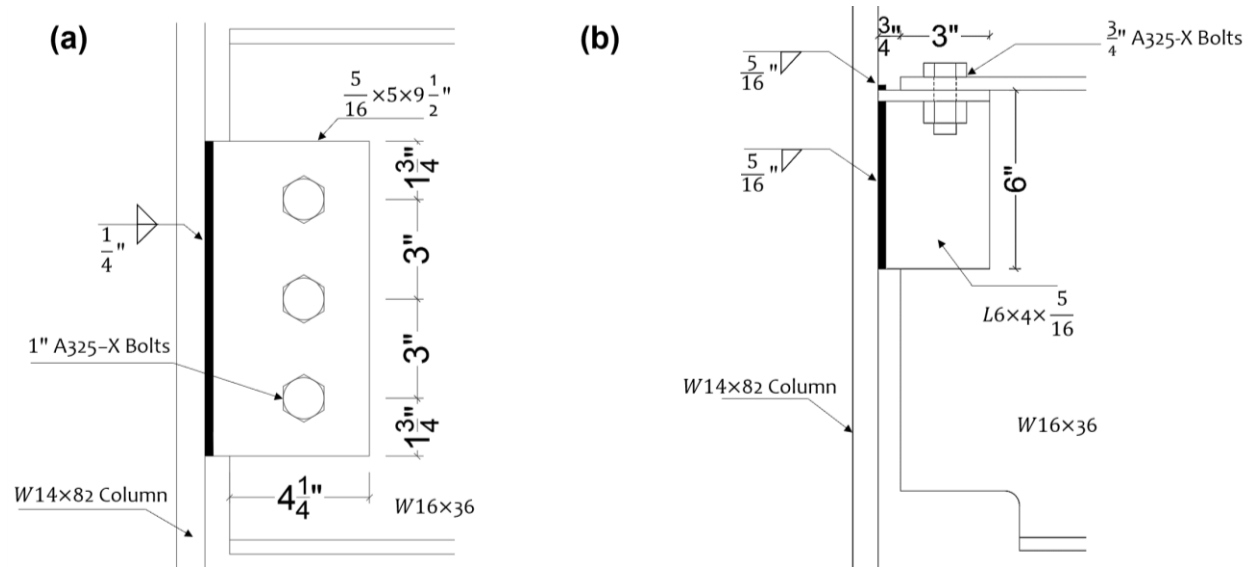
W16x36 Benchmark Designs for a Girder-Column (a) Shear Tab Connection and (b) Drop-In Connection
